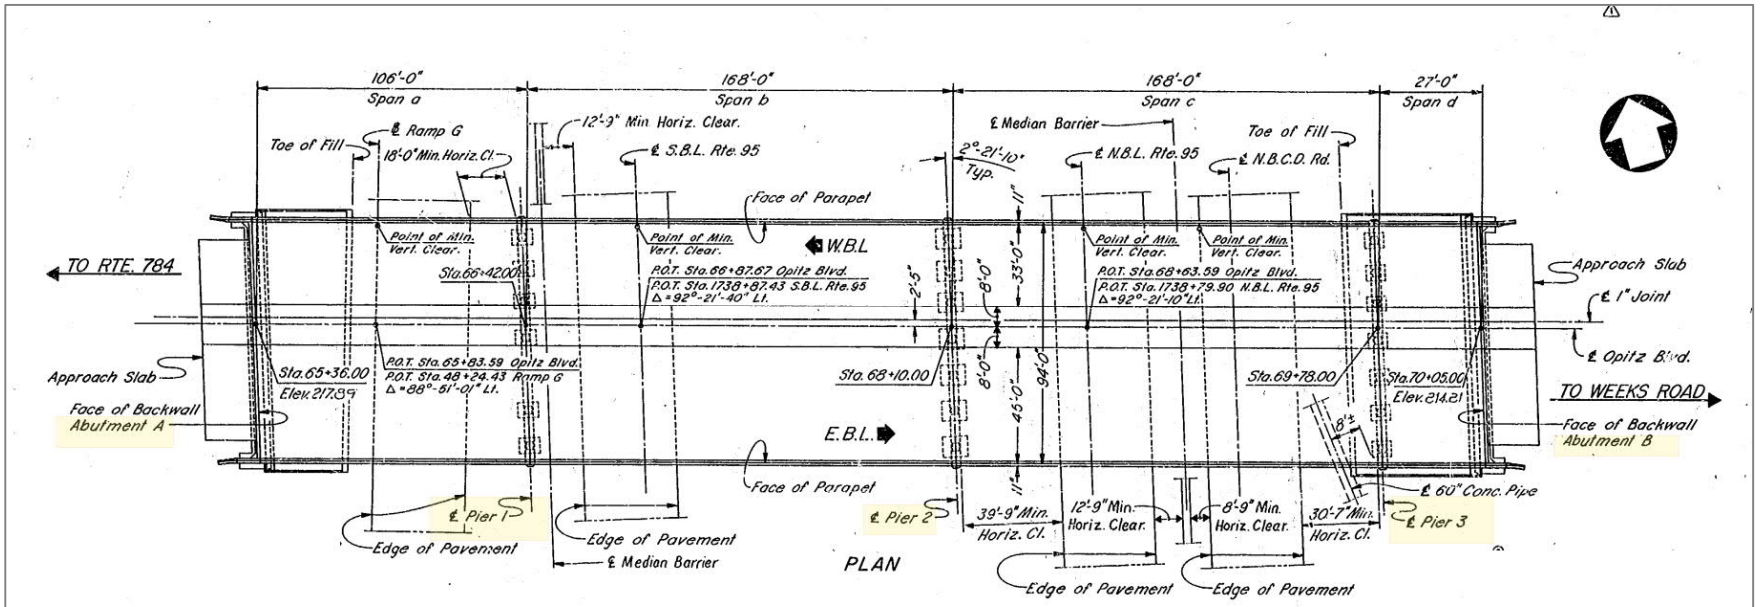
Existing Bridge Plan (Reference: VDOT, 1979, Sheet 1 of 47)
